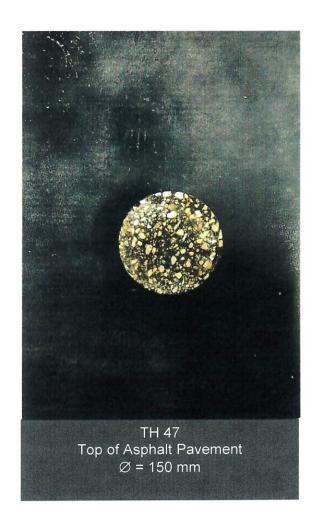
Specimen from Dugald Road, Eastbound Shoulder
